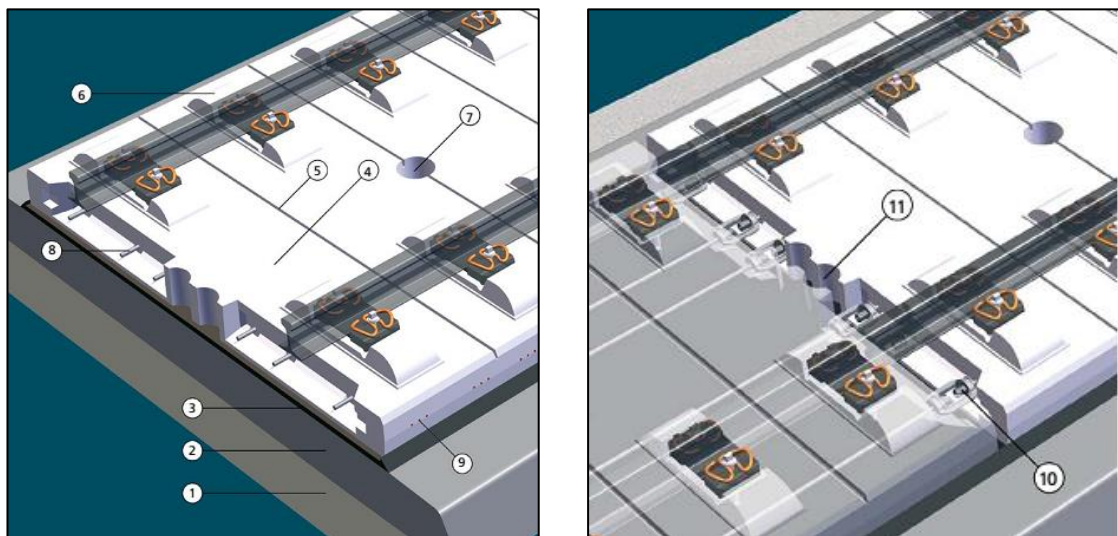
Structural components of Bögl (MaxBögl): 1 Frost protection layer (FPL); 2 Hydraulically bonded layer (HBL); 3 Bitumen-cement grout; 4 Precast slab; 5 Design cracking joint; 6 Rail support; 7 Grouting holes; 8 GEWI Steel; 9 Pre-stressed steel; 10 Turn-buckets and nuts; 11 Construction joint
